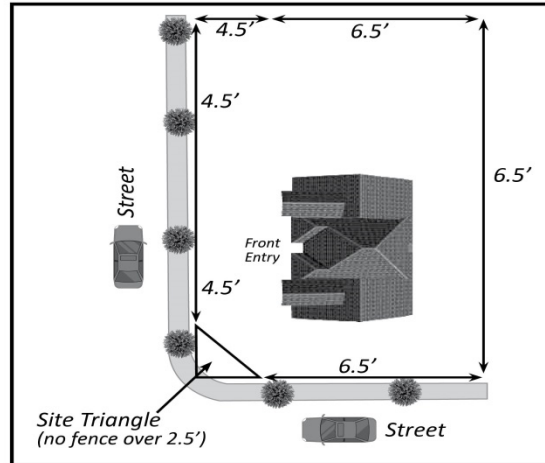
Fence location on corner residential lot (principal building facing longer side)
